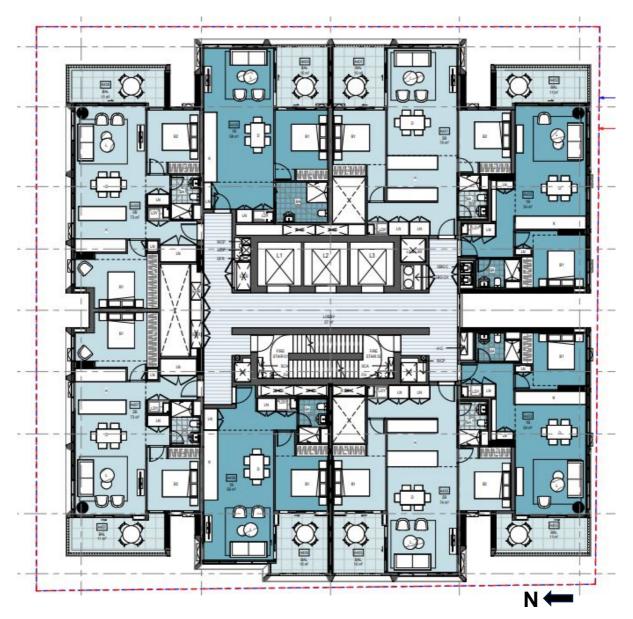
| Typical residential floor layout – Levels 3 to 18 (source: Applicant's RtS)
